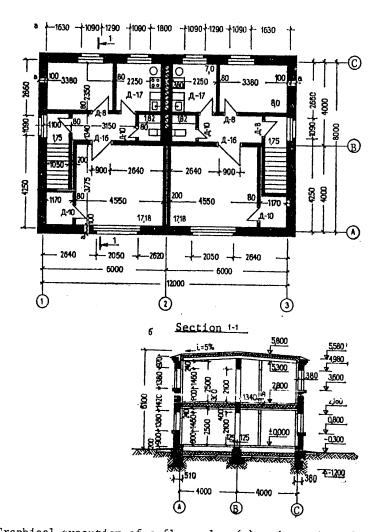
Graphical execution of a floor plan (a) and section of a building (b).
